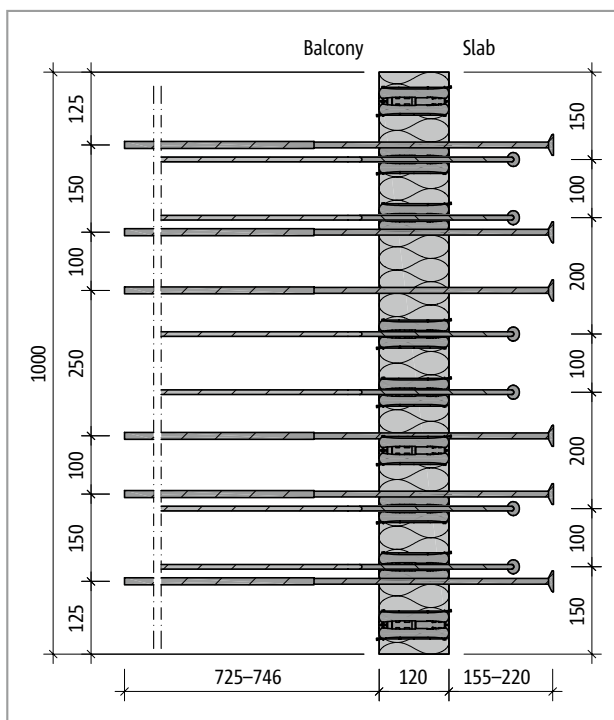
Schöck Isokorb® XT type K-U-M2: Product plan view
